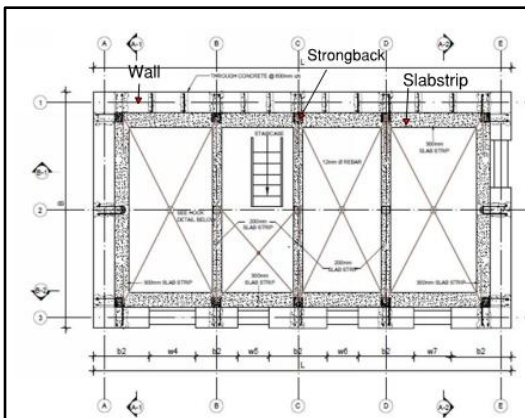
Plan view showing the location of retrofit elements, source : Build Change, Nepal
